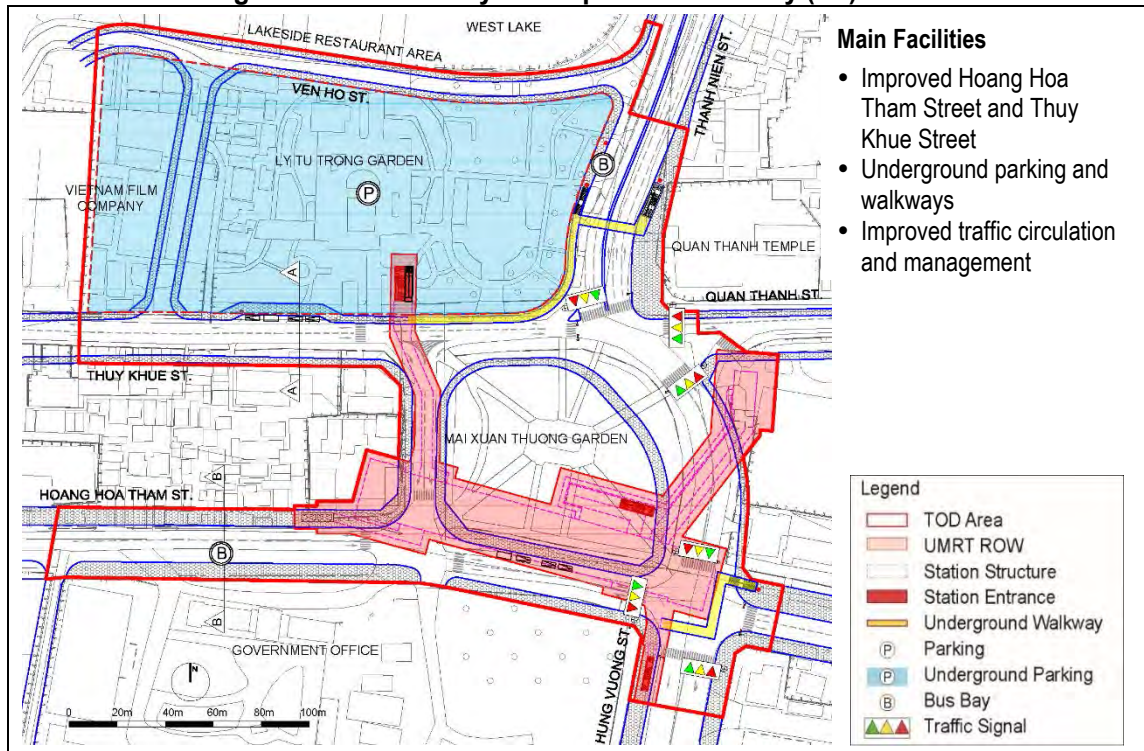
Facility Concept Plan of Ho Tay (C7) Station
